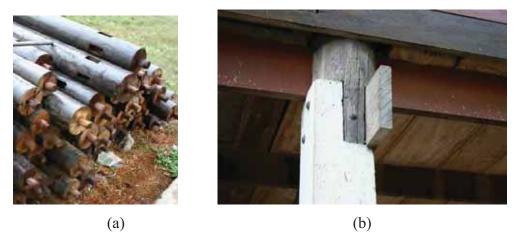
Upper level columns: (a) Mortised traditional columns; and (b) Joint of columns, beams and joists of the *transformed Thai house
